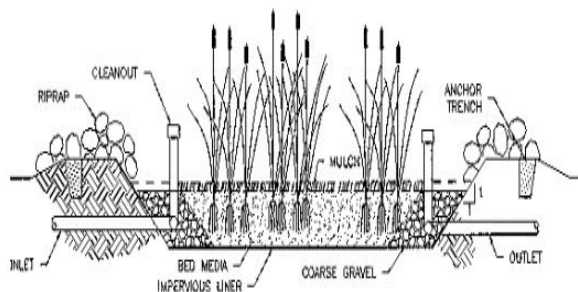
Typical configuration of a sub-surface flow Constructed wetland
